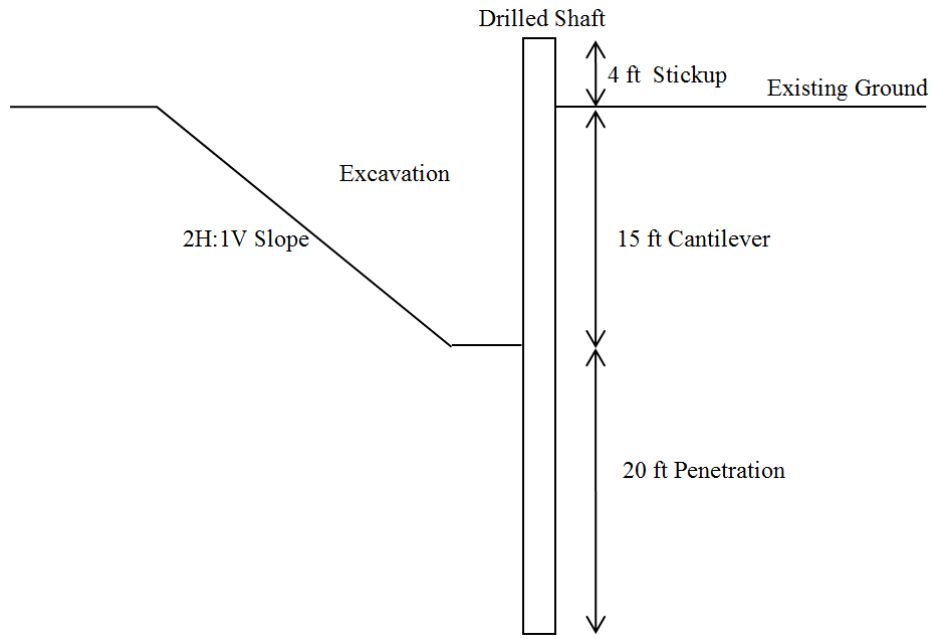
Cross-section of wall at center of excavation, facing east (Shaft No. 13).
